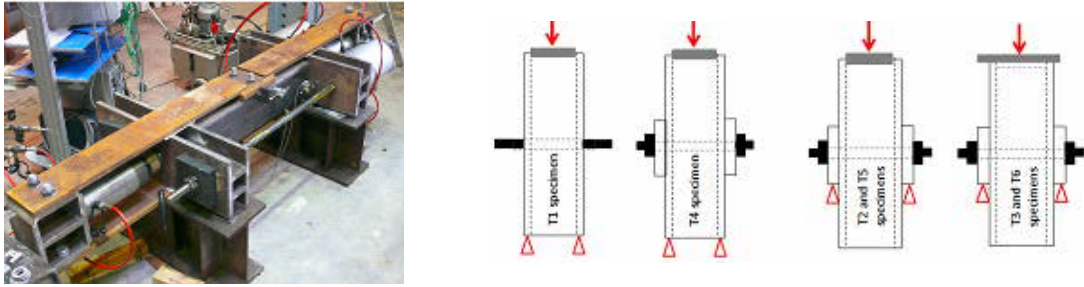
Figure X. Load introduction tests: steel-concrete connection through long bolts (Univ. of Liege)
